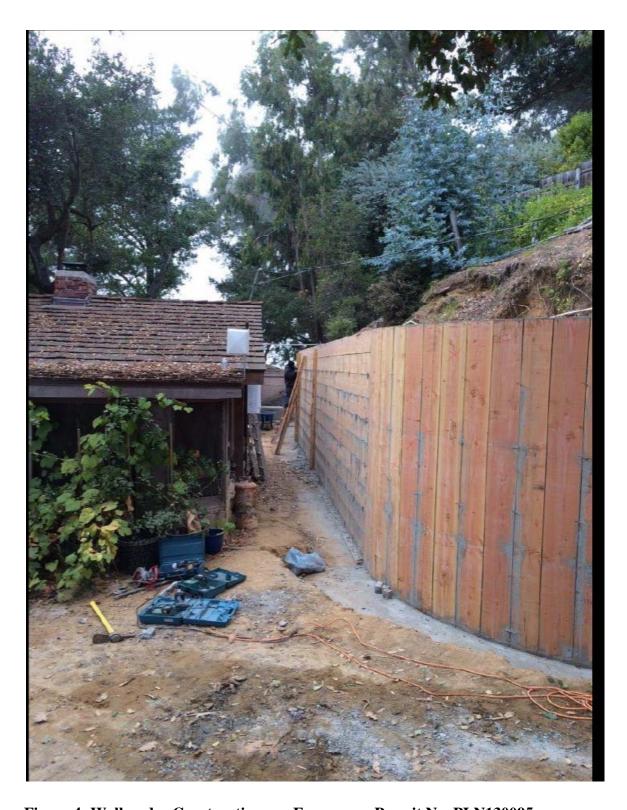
Wall under Construction per Emergency Permit No. PLN130095
